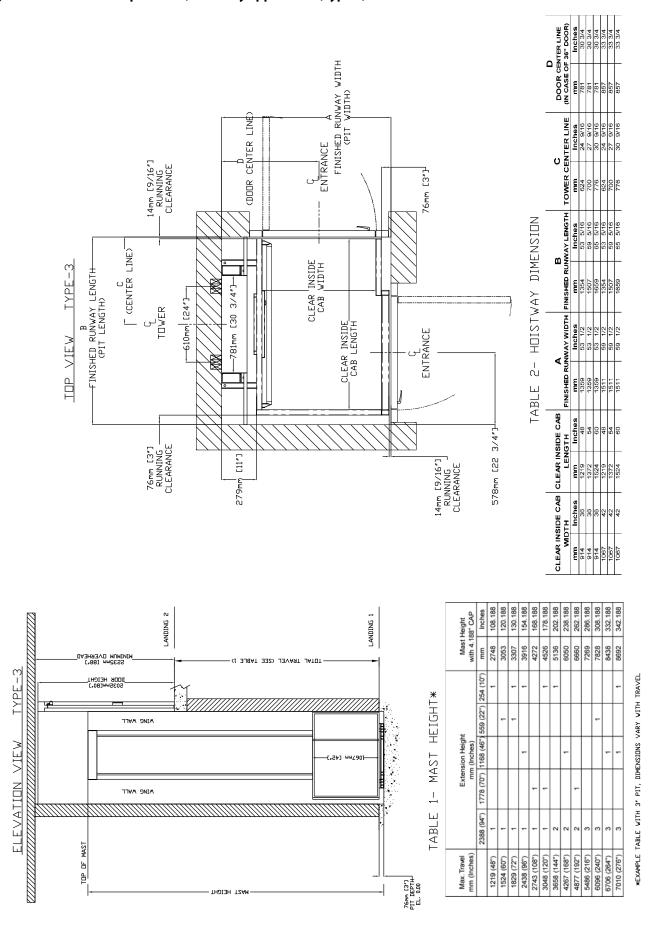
Elevation and plan view, hoistway application (Type 3, 45" opening)
